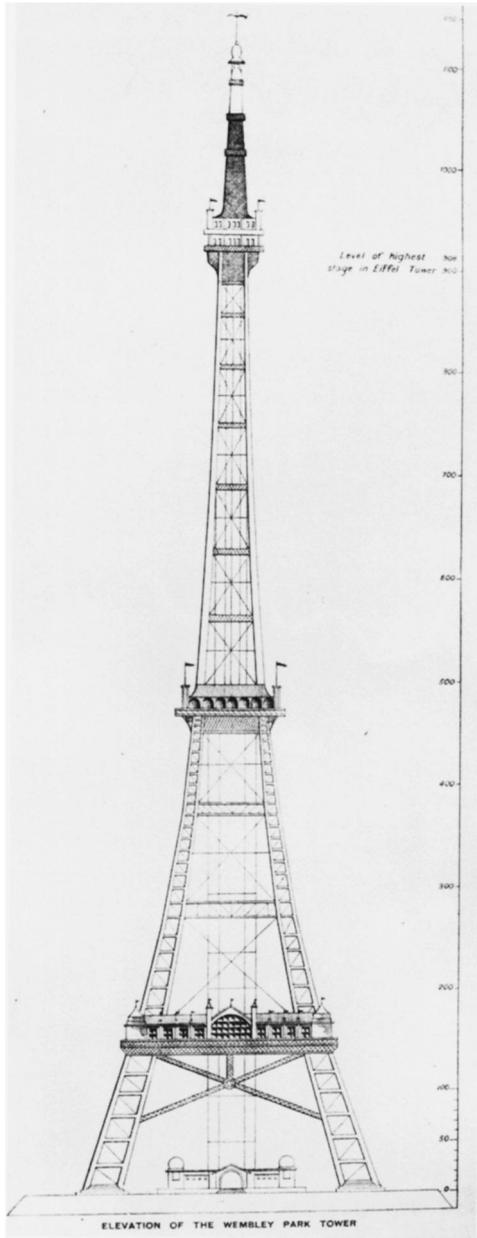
A. D. Stewart, J. W. Maclaren, and W. Dunn, Revised elevation, Wembley Park Tower, London, 1891 (*The Engineer*, September 1893).
